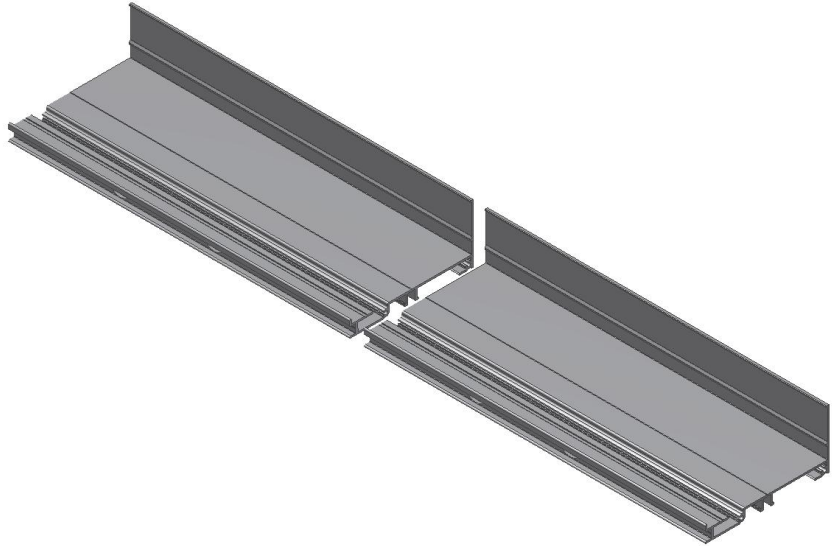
Extruded sill flashing longer than 24' in length should be spliced.
